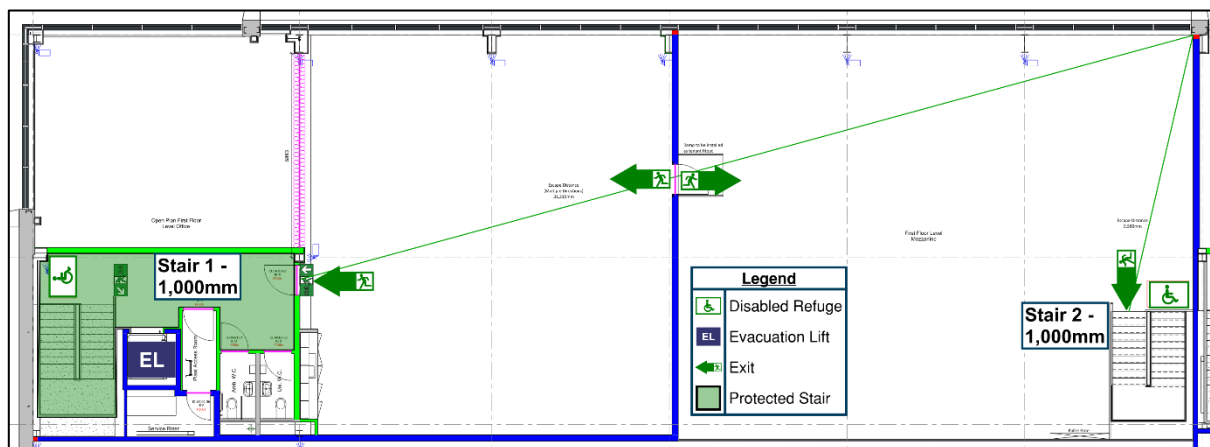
Typical Stair Configuration at First Floor (Unit 4)
